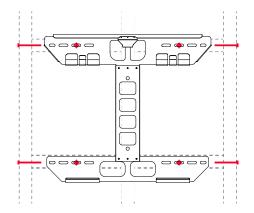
Anchoring the Bracket to Blocking between Wood Studs
